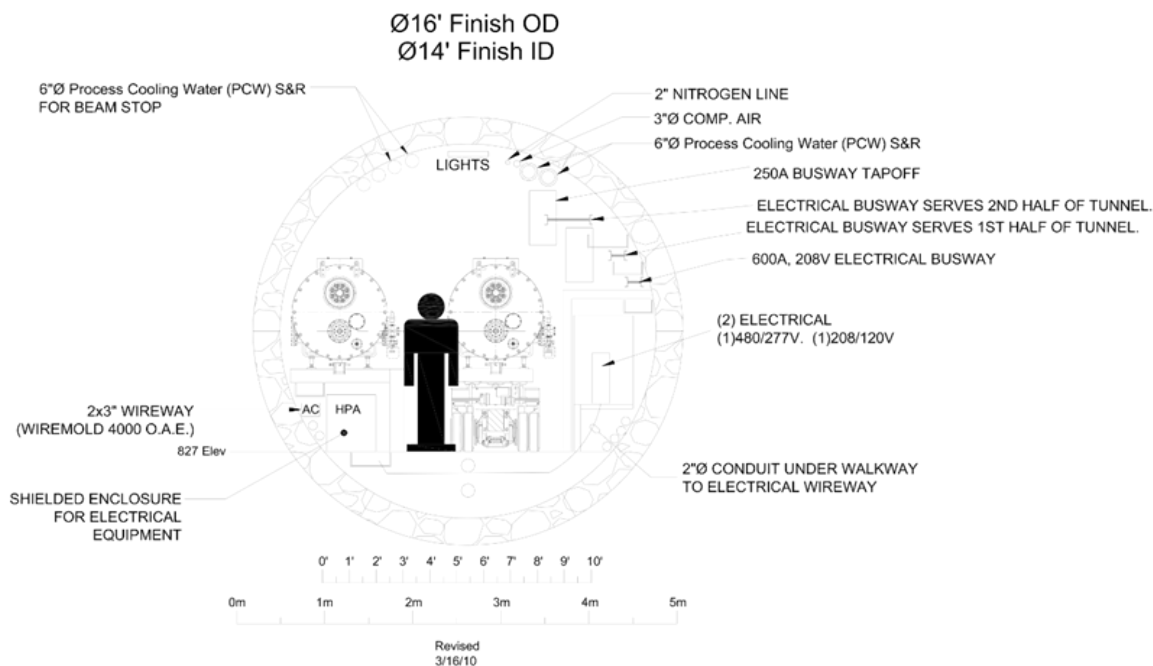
Tunnel cross-section showing safety provision for persons passing, equipment placement, shielding and utility pipes and ducts.
